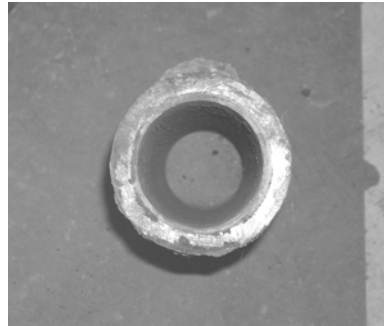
Sample 4 from the Foster Street Pipeline illustrating a section of undamaged CICL pipe
